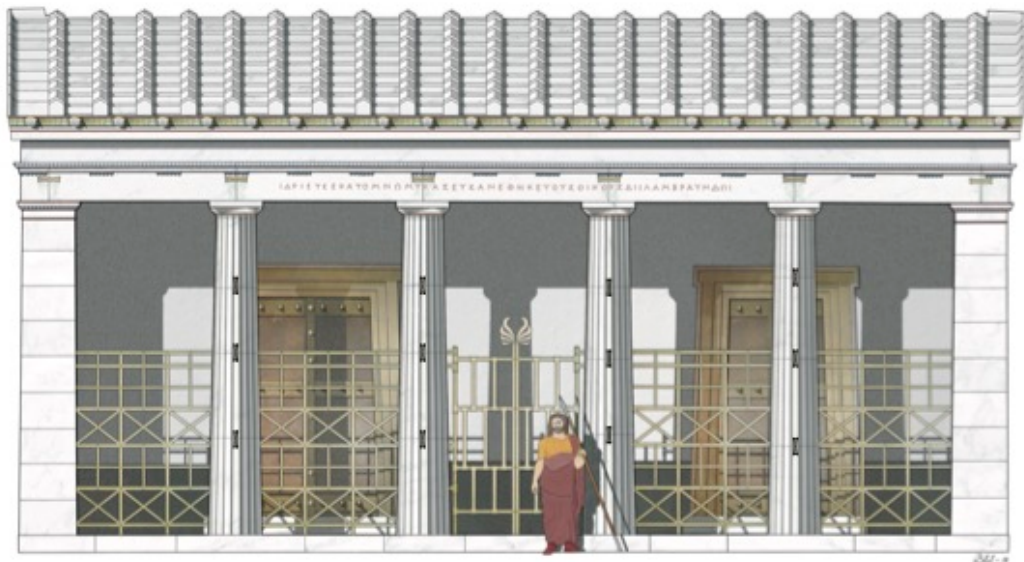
Reconstruction of the Oikoi building (J. Blid)
